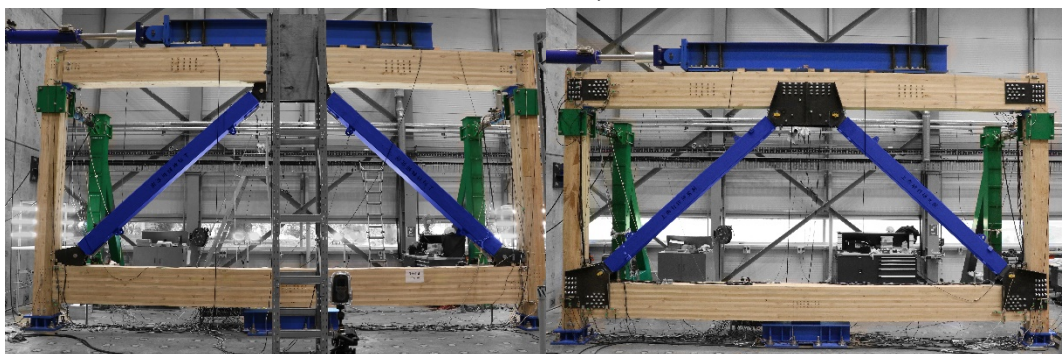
Hybrid system tests (left: with dowelled connection system, right: with screwed connection systems)
